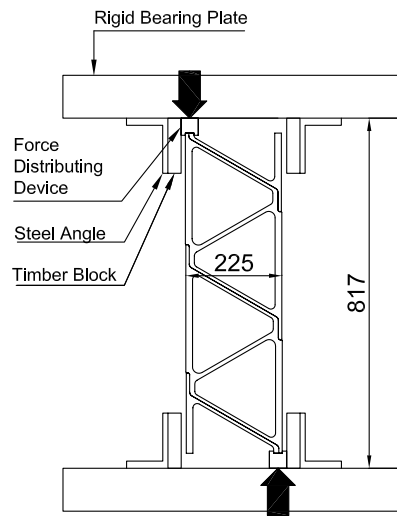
Experiment set-up for eccentrically-loaded ASSET specimens
